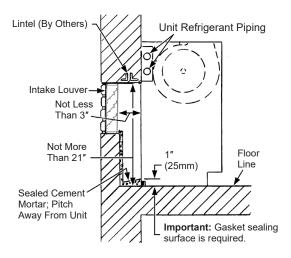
16%" (422 mm) Deep Unit with Open Refrigerant Pipe Chase & Above-Floor-Level Outdoor Intake Louver Application with Chased Wall
